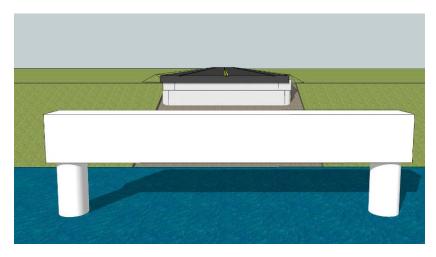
Construction of Drilled Shafts (Prior to Removal of the Existing bridge)
